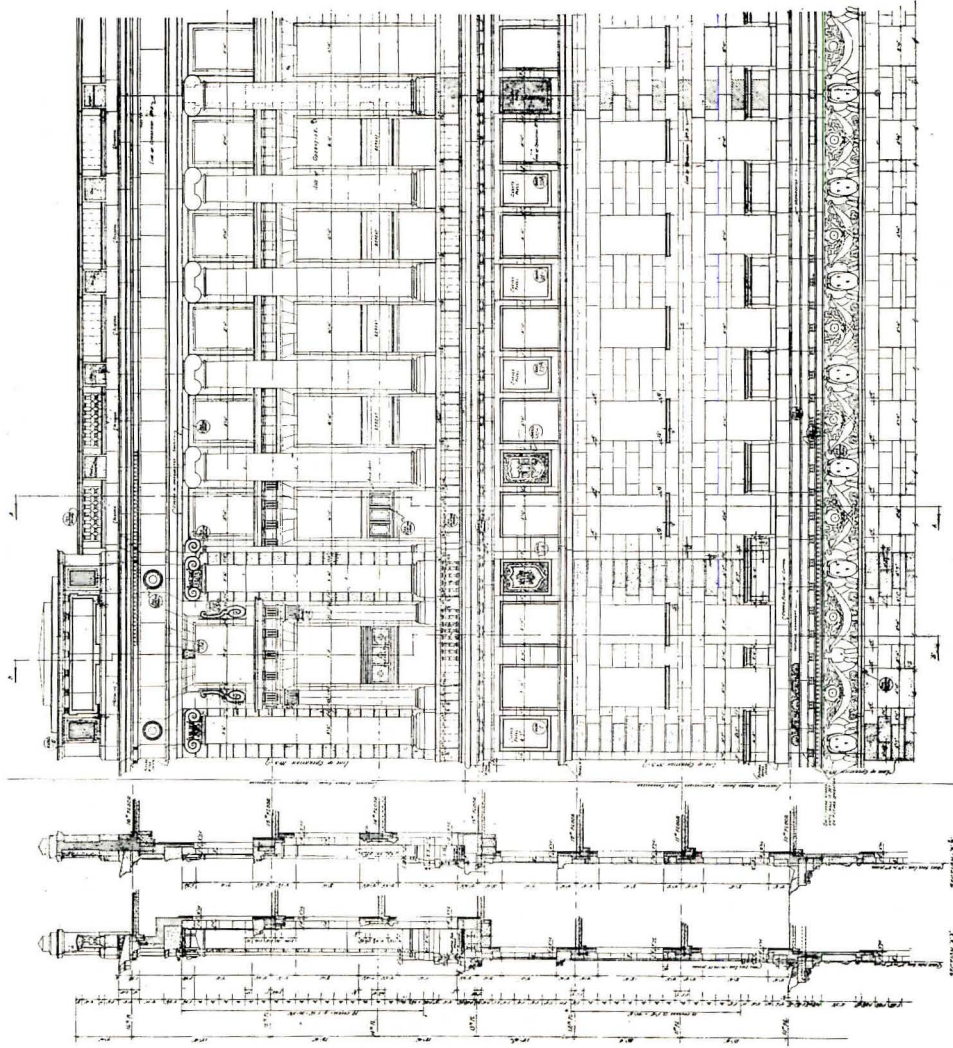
Elevation on Broadway, Building for the Standard Oil Company, New York City. Carrere & Hastings, Architects.
